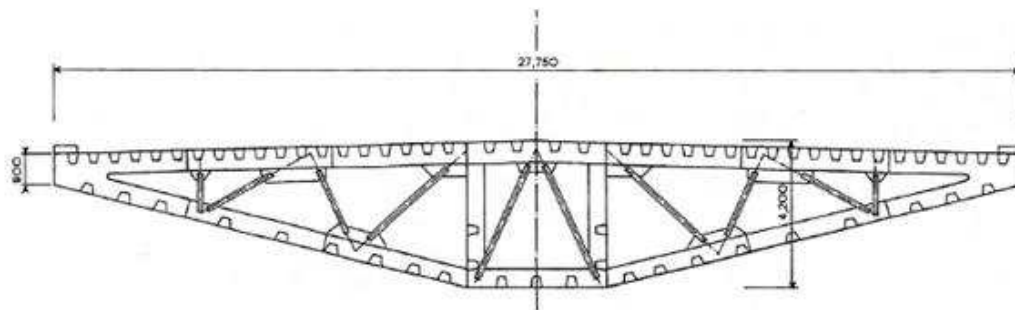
Cross-sectional view of the steel girder of the Millau Viaduct
